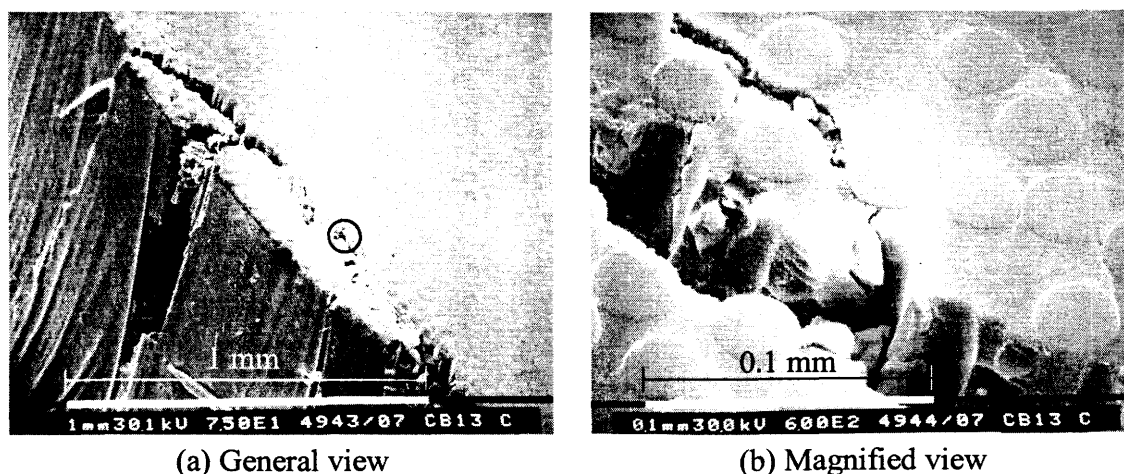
SEM images of bar cross section at 280 mm from the test end after static test (Specimen C-bar 25% Air #1).
